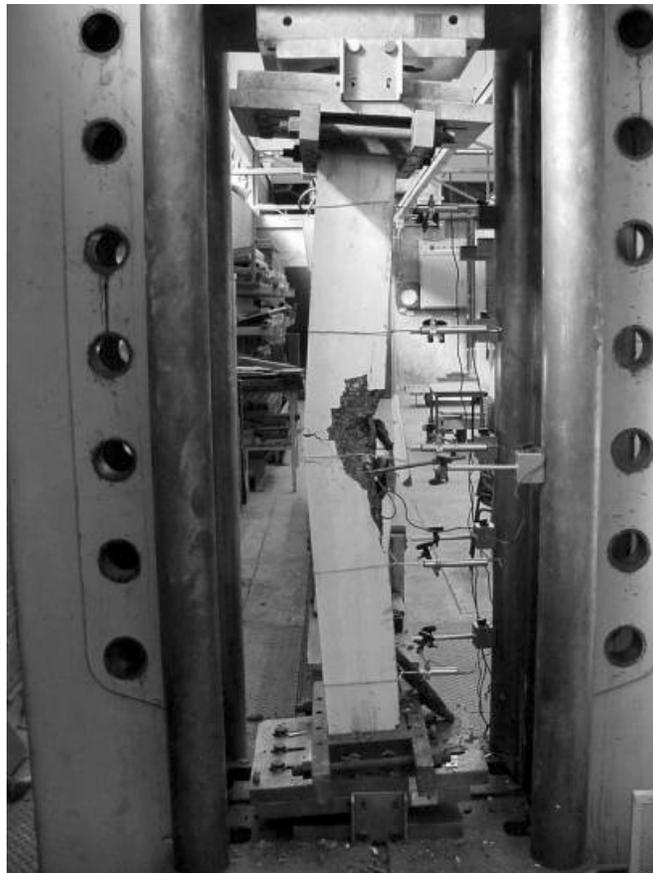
Testing setup of reinforced geopolymer concrete columns.
